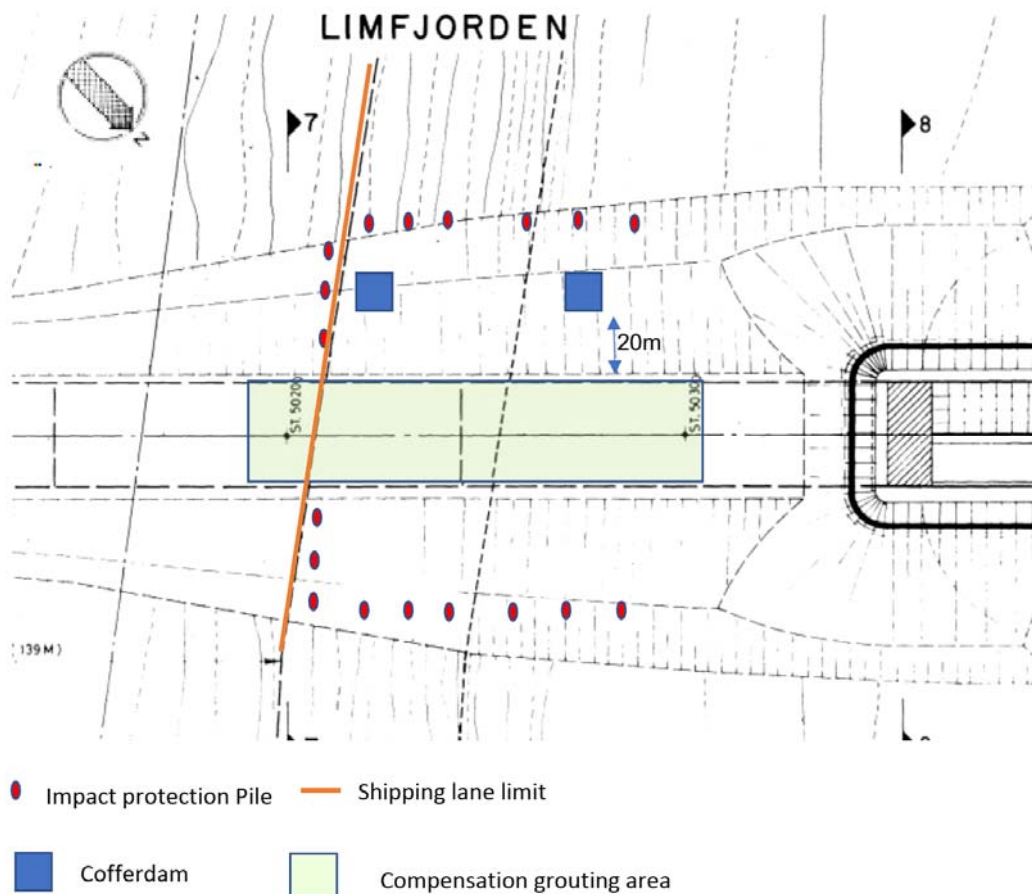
Indicative plan showing cofferdams and ship protection piles.
